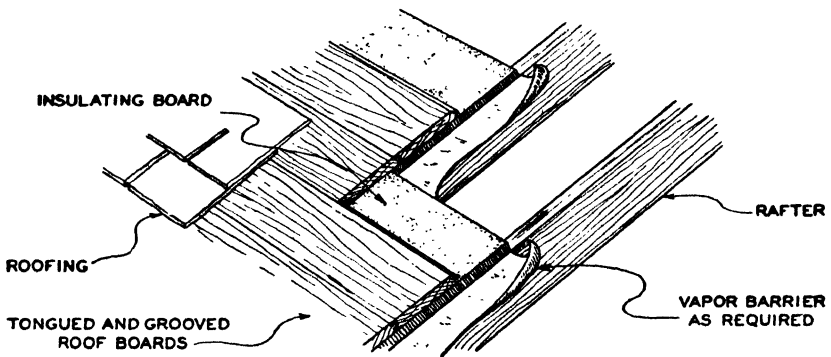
Insulating Board Applied as Roof Insulation on Pitched Roof and Covered with Wood Sheathing
